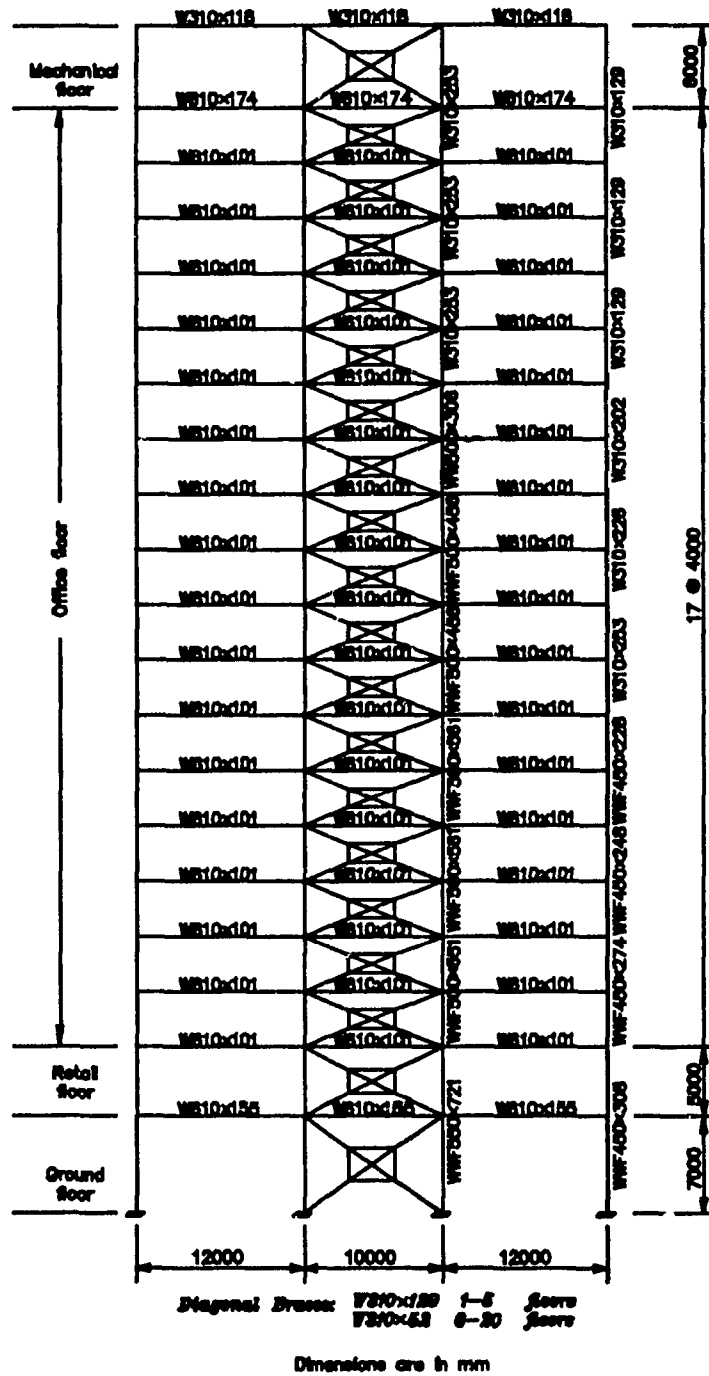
Elevation and member sizes of FDBF (N-S direction, column lines 2 and 3)
